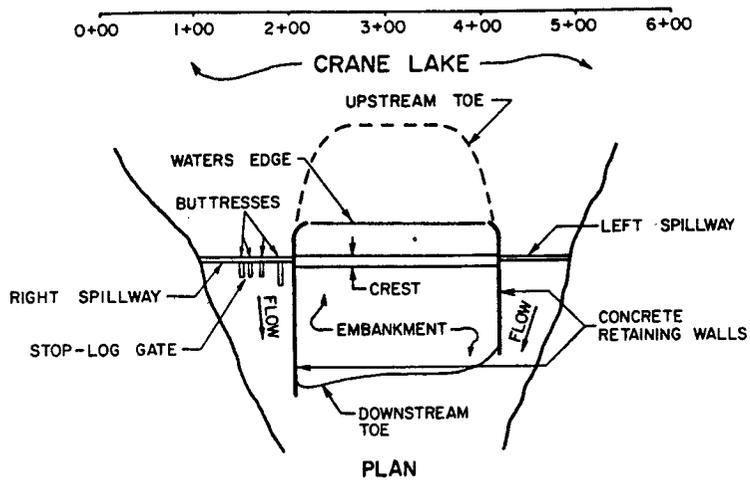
Crane Lake Dam repairs plan and spillway elevations.
